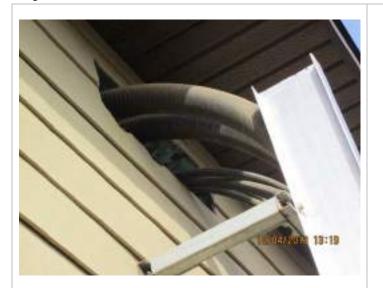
Install cover or seal siding where electrical cables enter at southeast corner.
